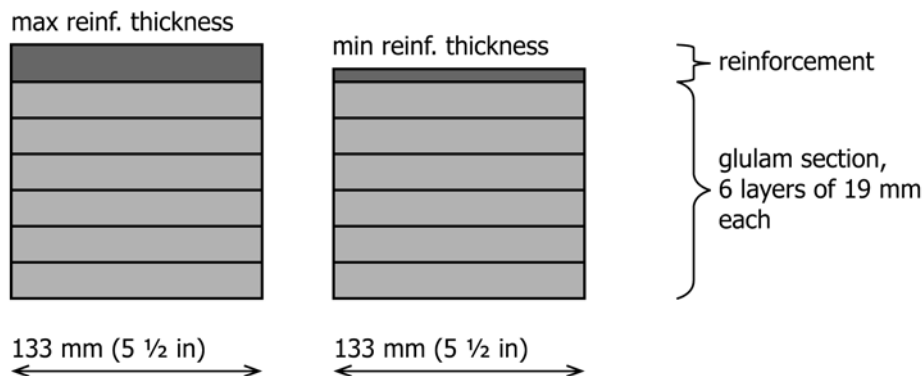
Delamination Specimens for Modified Specification D2559 Test
